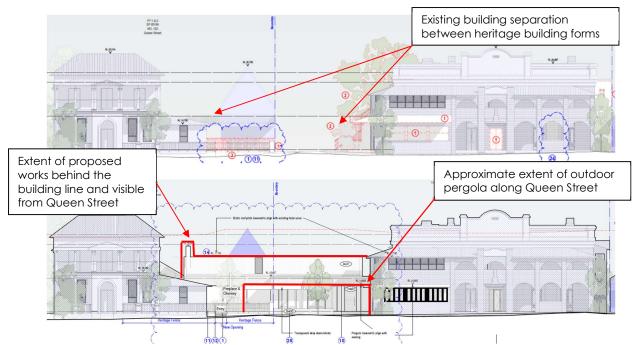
Extract from the elevation plans, showing the existing elevation (top) and proposed elevation (bottom) (H& E Architects, 2024)
